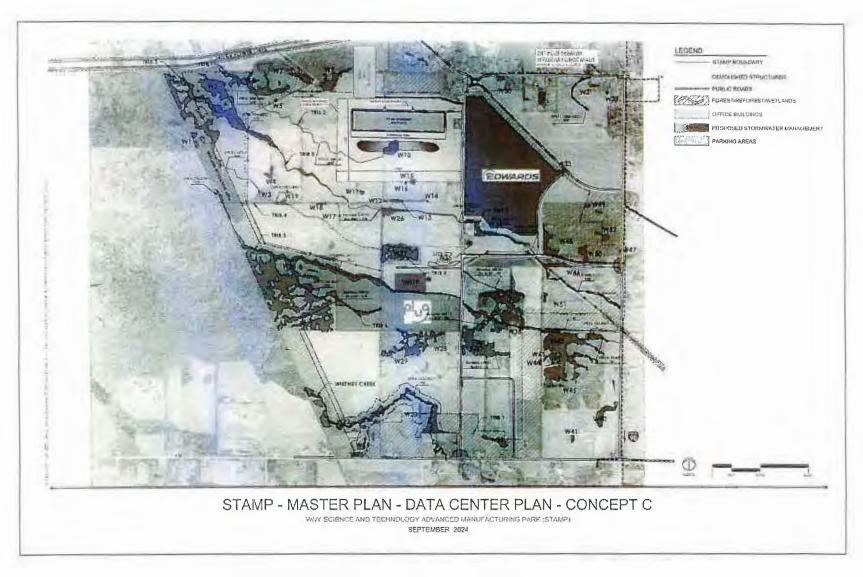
C Data Center Facility Schematic Site Plan - Concept C
